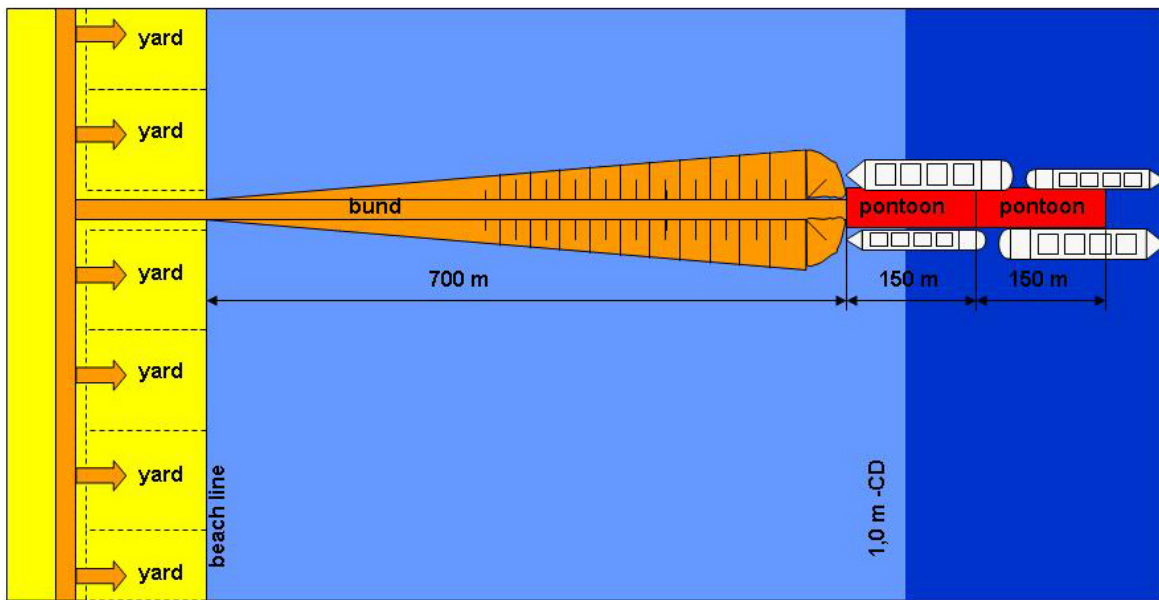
Stageship cleaning and dismantling facility, plan view on coast
